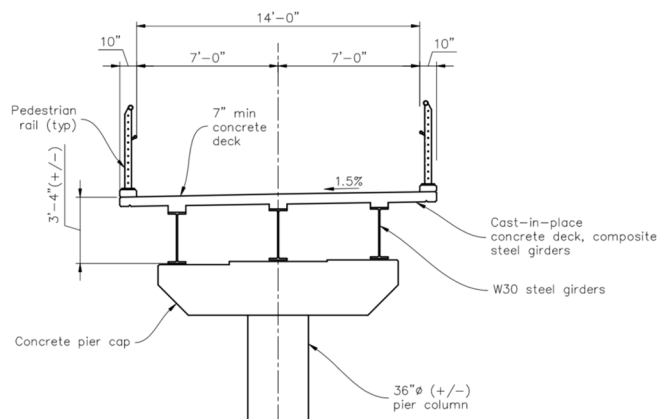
CROSS SECTION SCHEMATIC OF ALTERNATIVE 2
